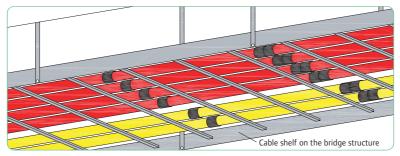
Cable ducting installed in a roof or bridge structure.
